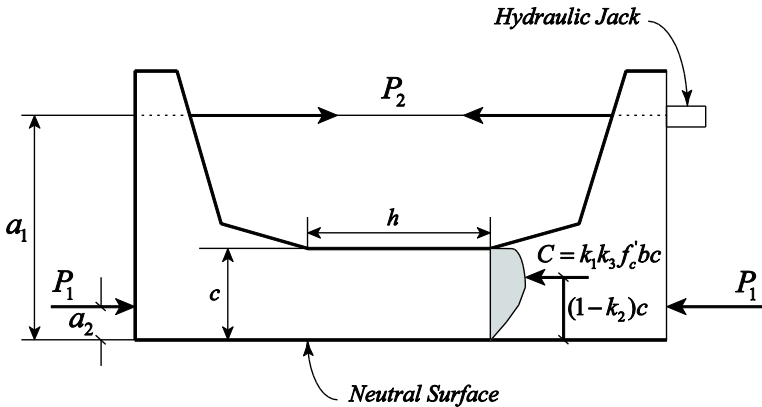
Hognestad's test set-up for derivation of concrete stress block parameters
